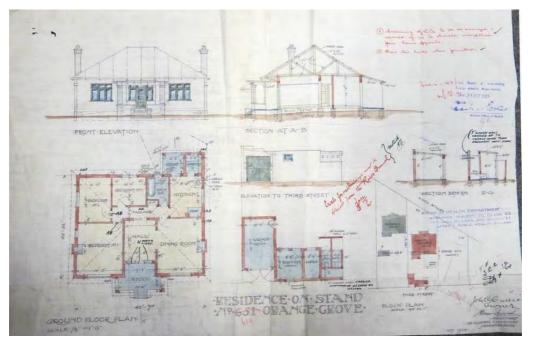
Plan for proposed new houses on Stand 659, Orange Grove from 1924 Good example of three bedroomed single storey residence with corrugated iron roofing and centrally located front stoep
